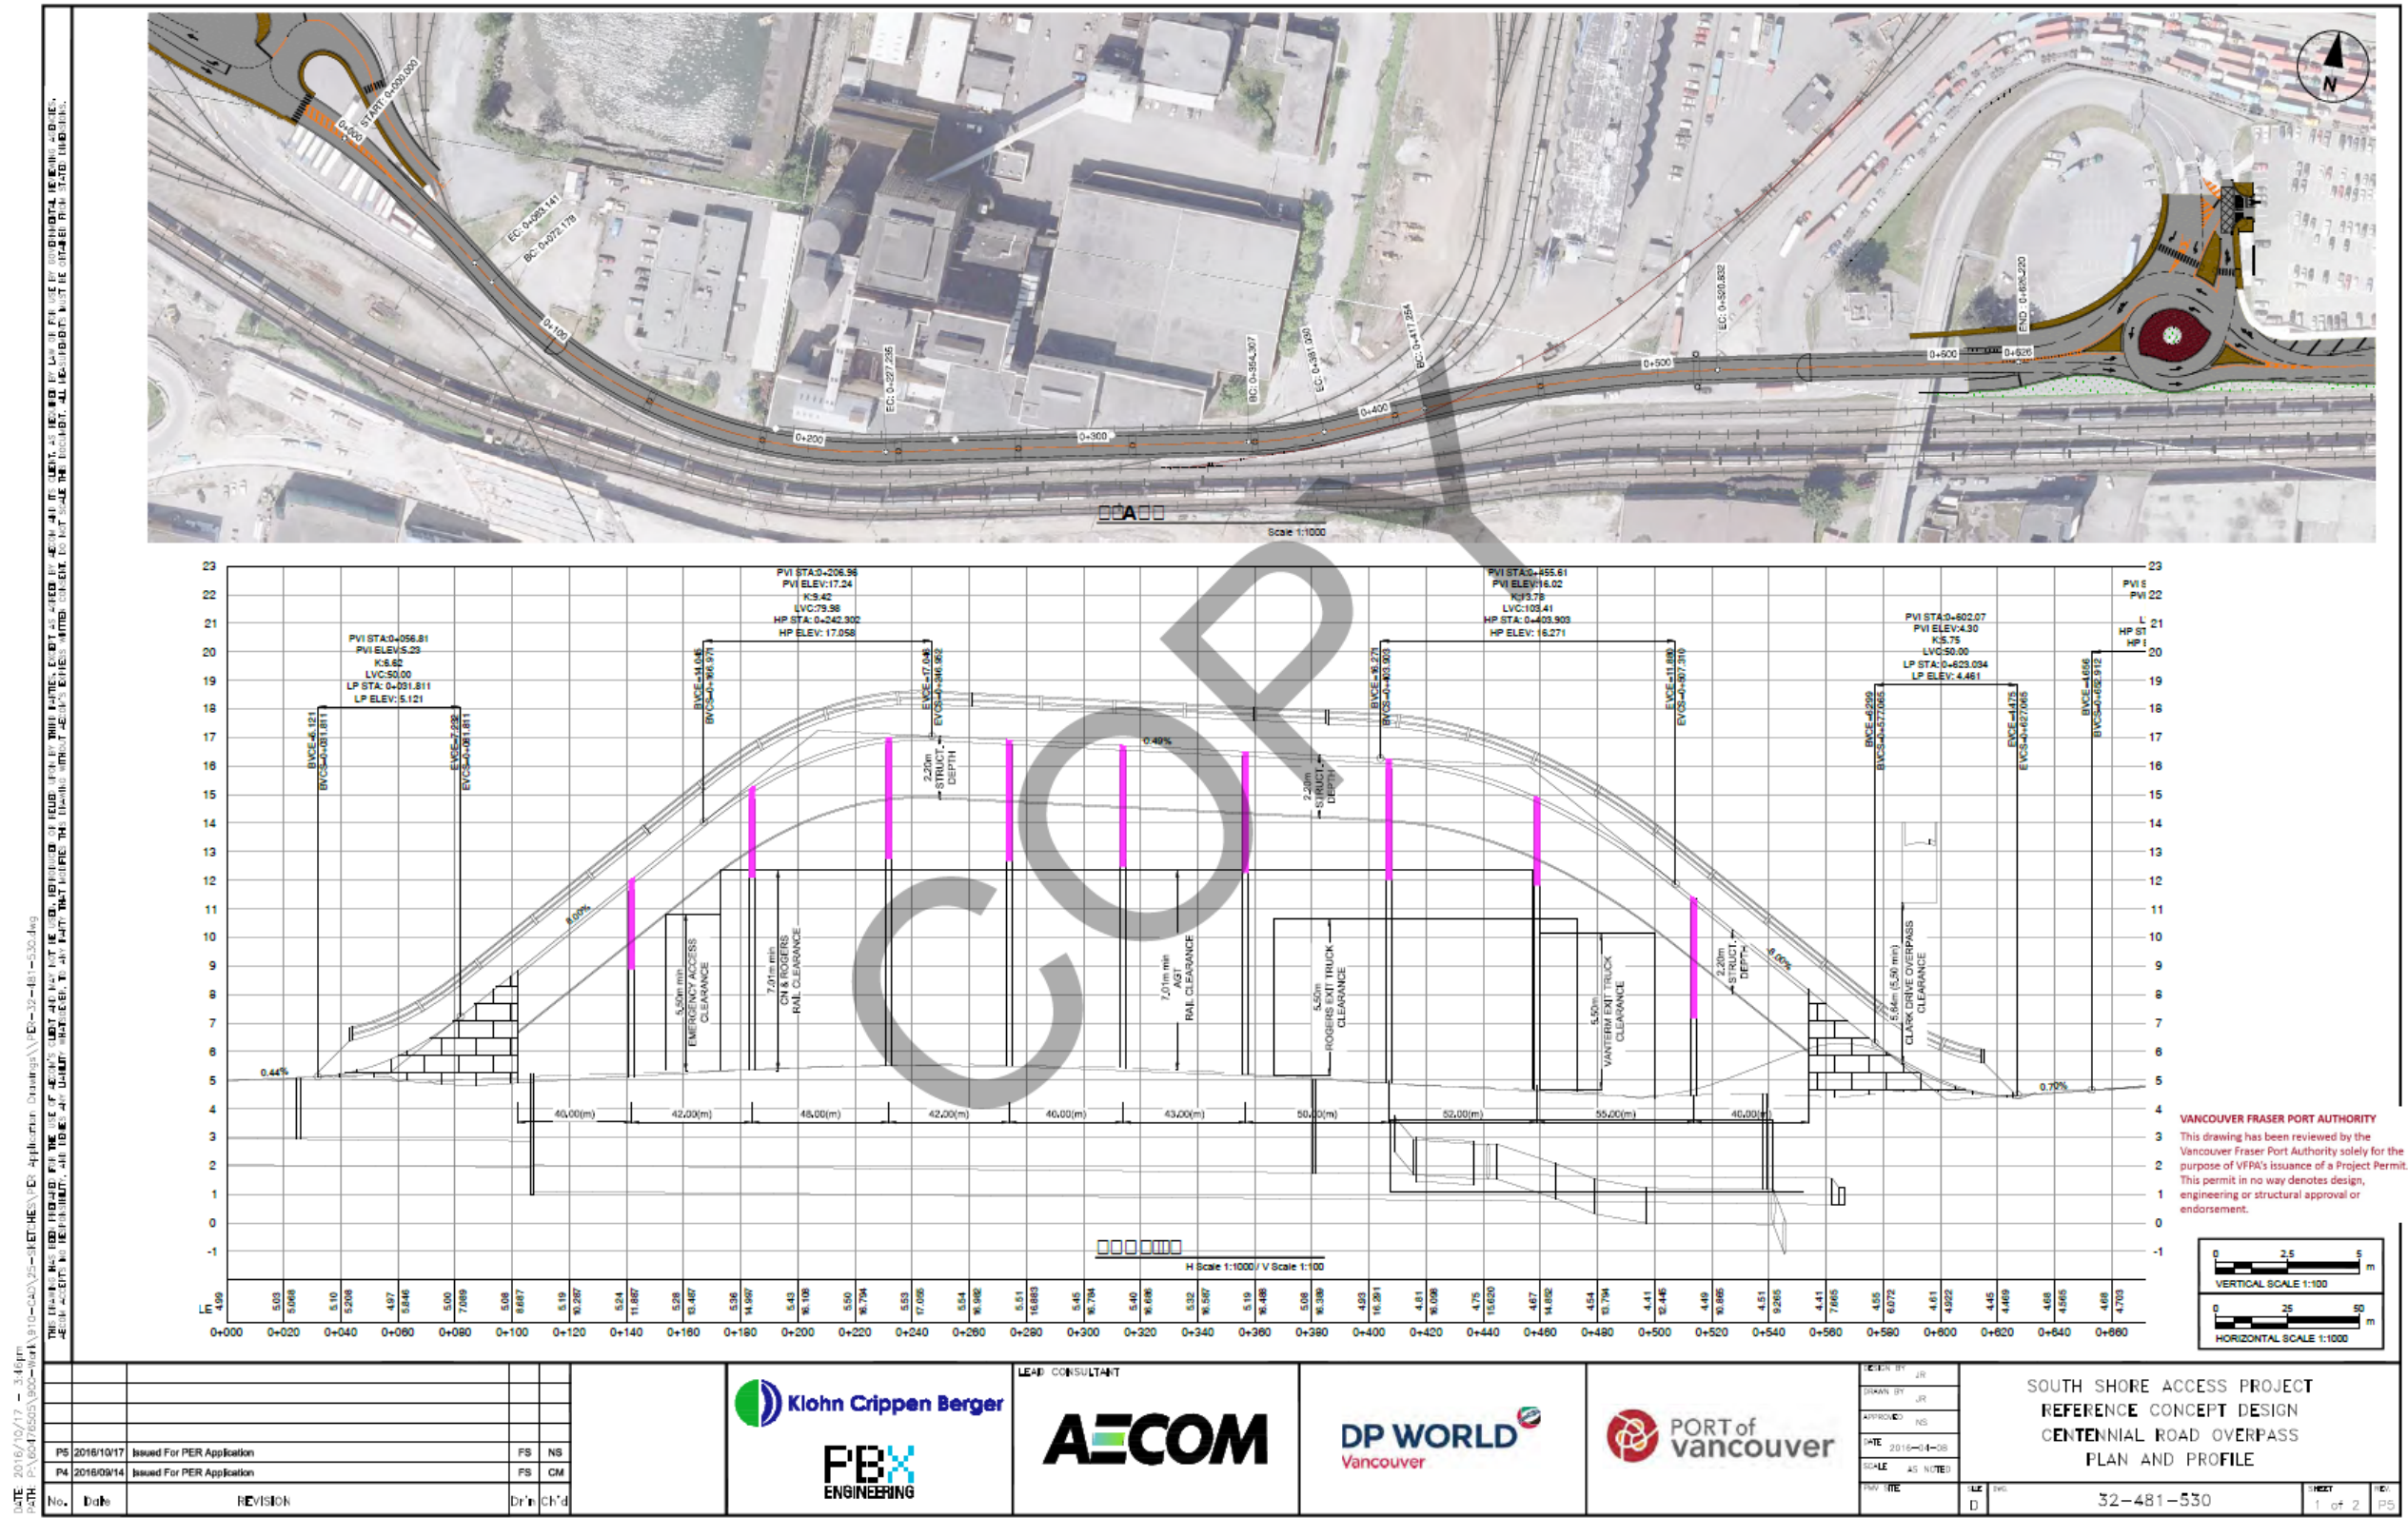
Proposed viaduct and terminal access roads including the Centennial Road over pass.
